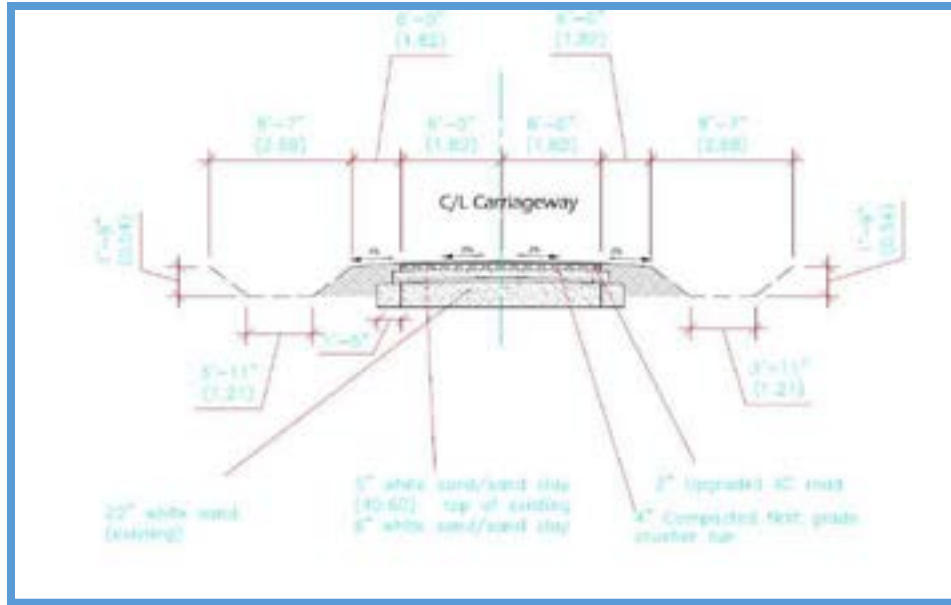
Cross section of an Asphaltic Concrete on Crusher Run Secondary Road
